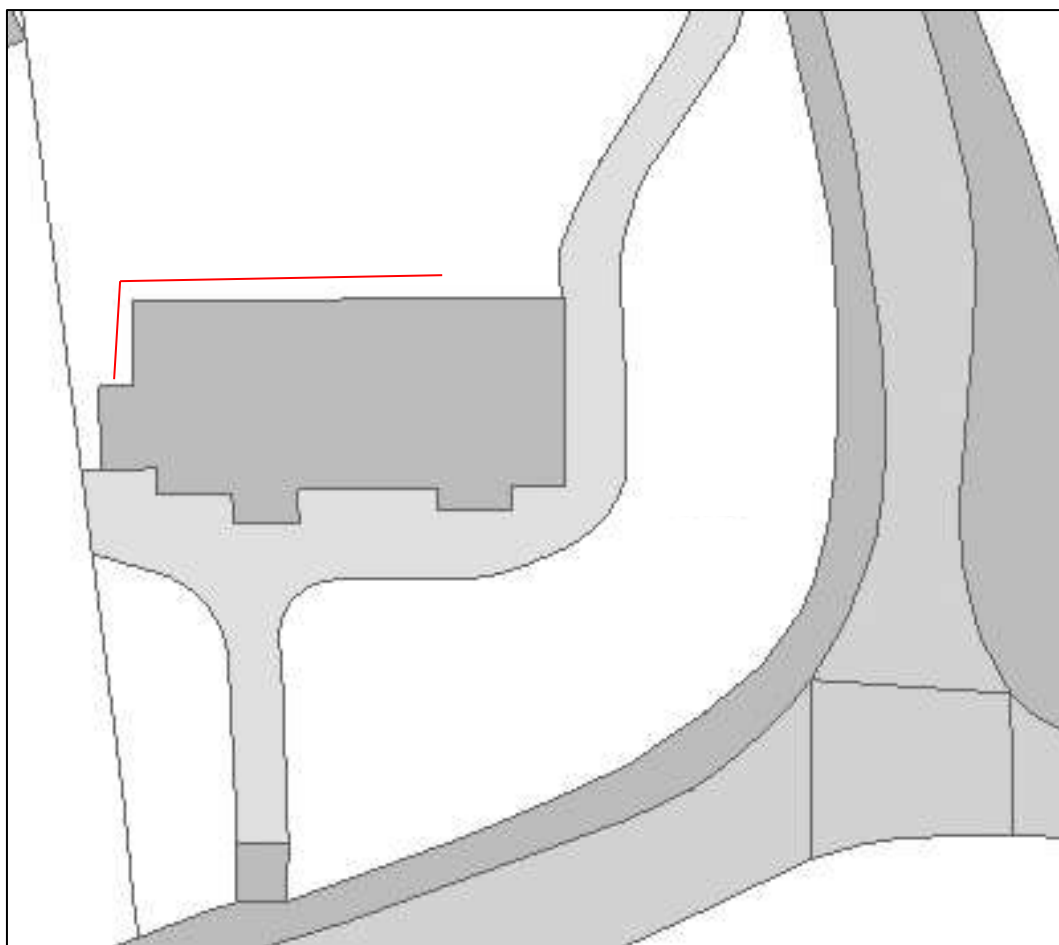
SKETCH PLAN OF THE PROPOSED DRAINAGE RUN, SHOWN IN RED.
